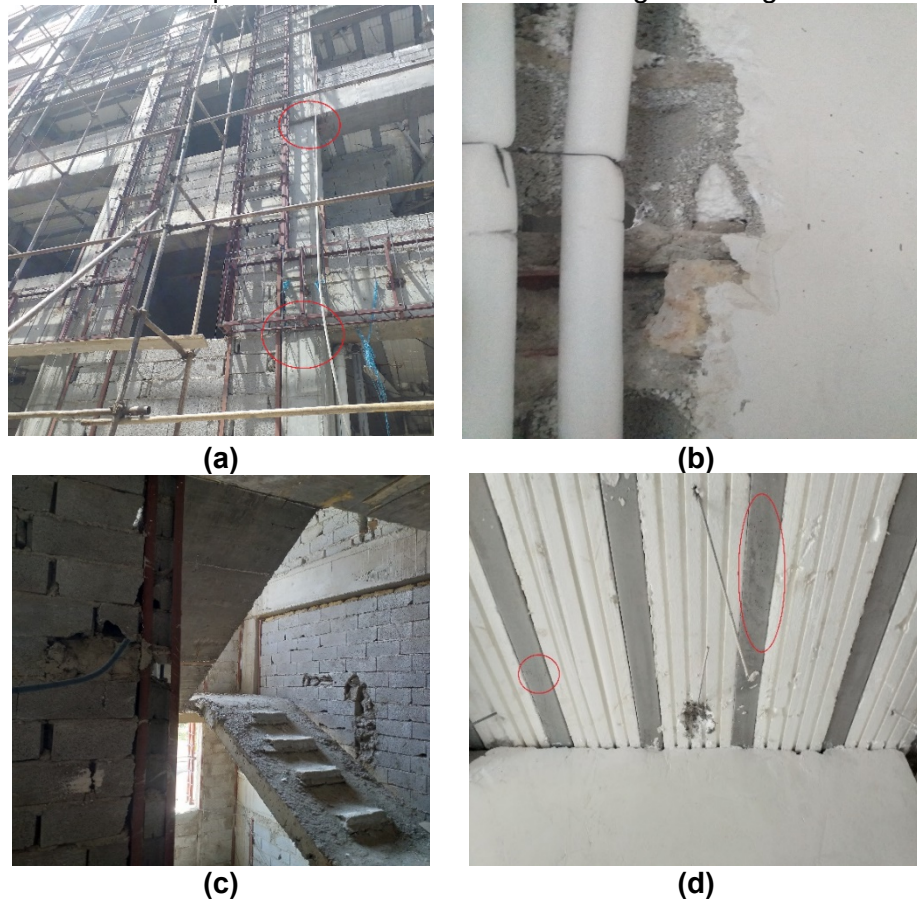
Second building information: (a) connection problems between columns and beams; (b); remove the structure (c) using LECA blocks; (d) corrosion concrete problem
